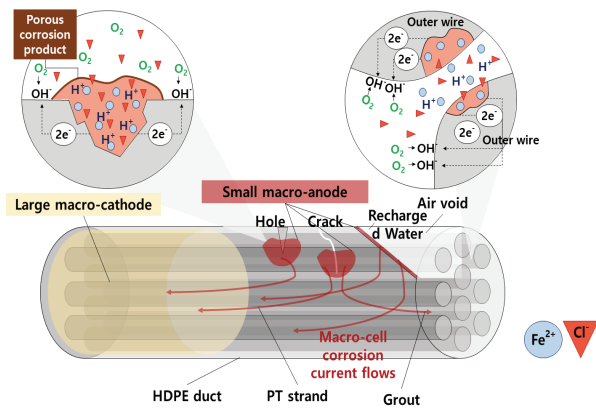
Corrosion mechanism of pitting, crevice, and macro corrosion
